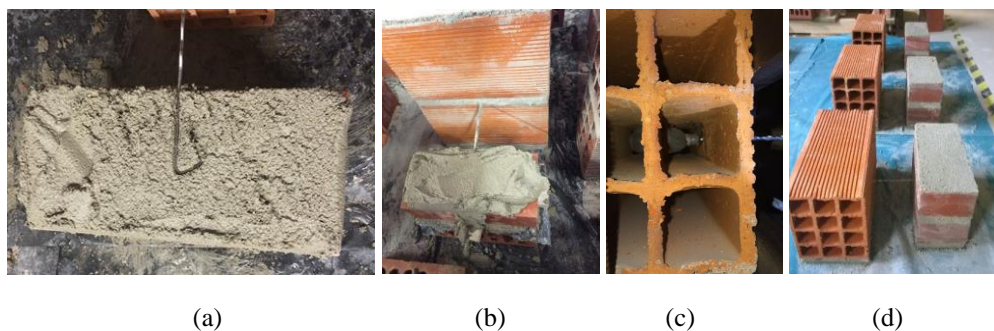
Construction details of the specimens: (a) wall tie on brick infill leaf; (b) wall tie on brick veneer leaf and (c) T5 tie attached to brick masonry leaf and (d) T5 tie in double assemblages
